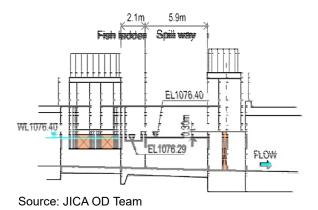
Width of Fish Ladder and Spillway
